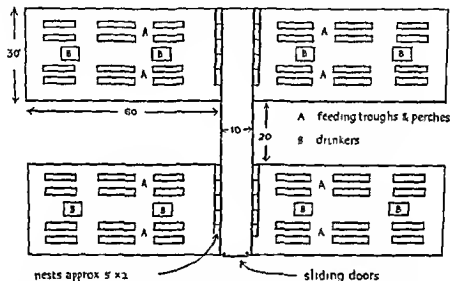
DEEP LITTER HOUSE ARRANGED ON THE "H" PLAN
